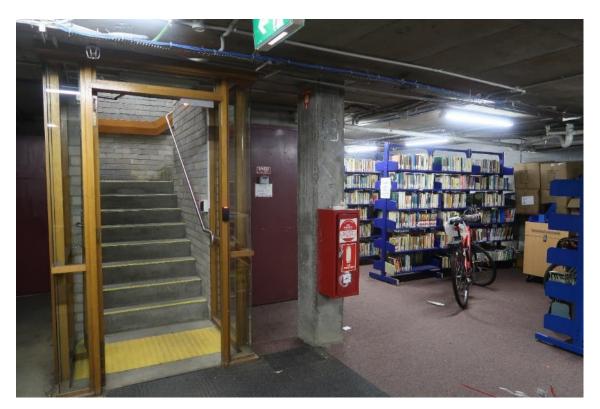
Compactus room (LG.01) and stair to first floor work room (G.21)
